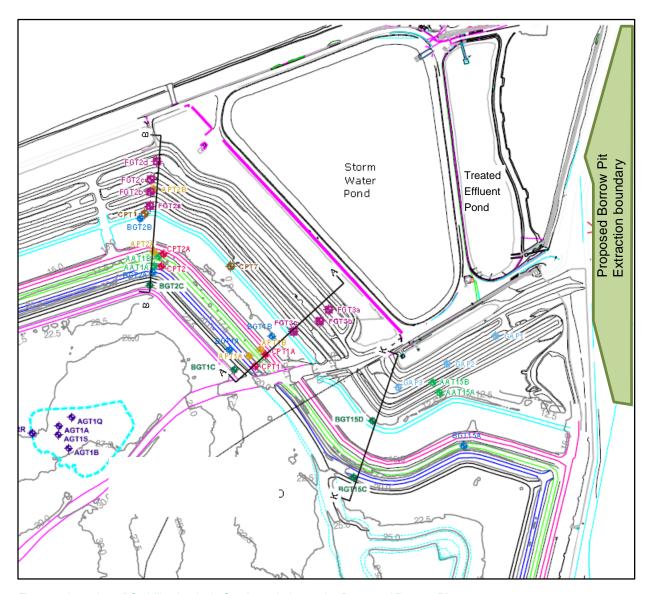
Location of Stability Analysis Section relative to the Proposed Borrow Pit
